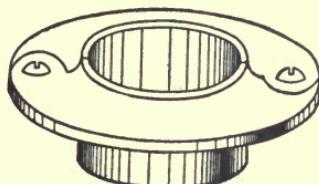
Floor-Plate Adjusted to Plain Sleeve for Carrying Pipe through Floor or Partition.
